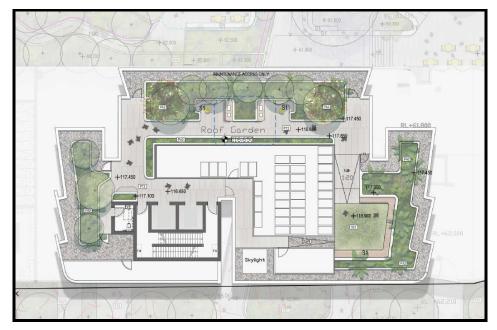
Rooftop communal area for Building B (Source: Landscape Plans March 2023)
